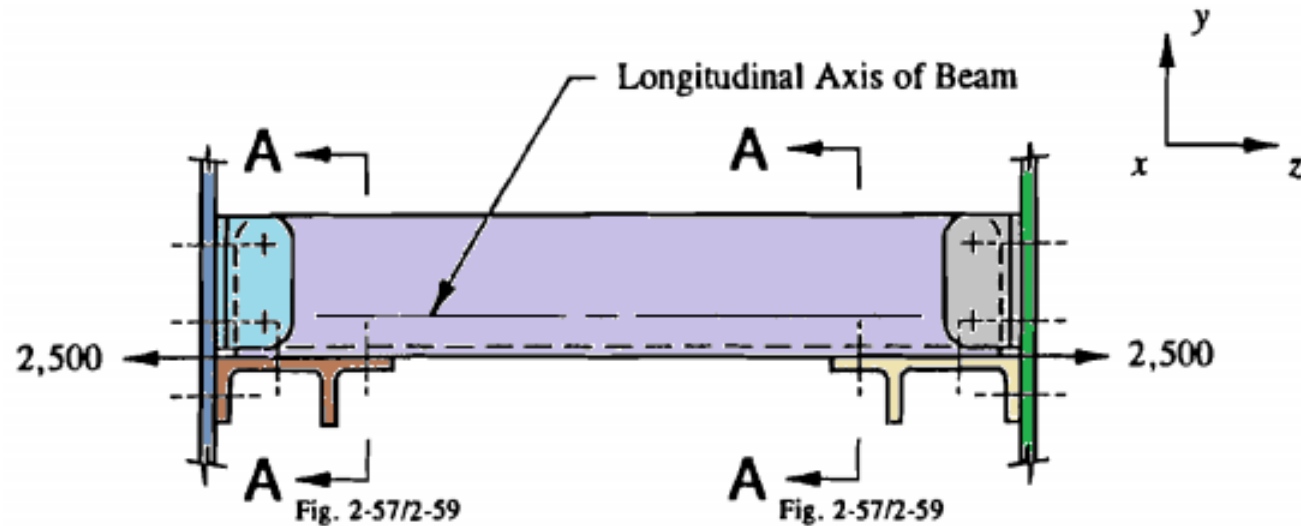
Eccentrically loaded beam. Axial tension force applied through the lower flanges of the beam.
